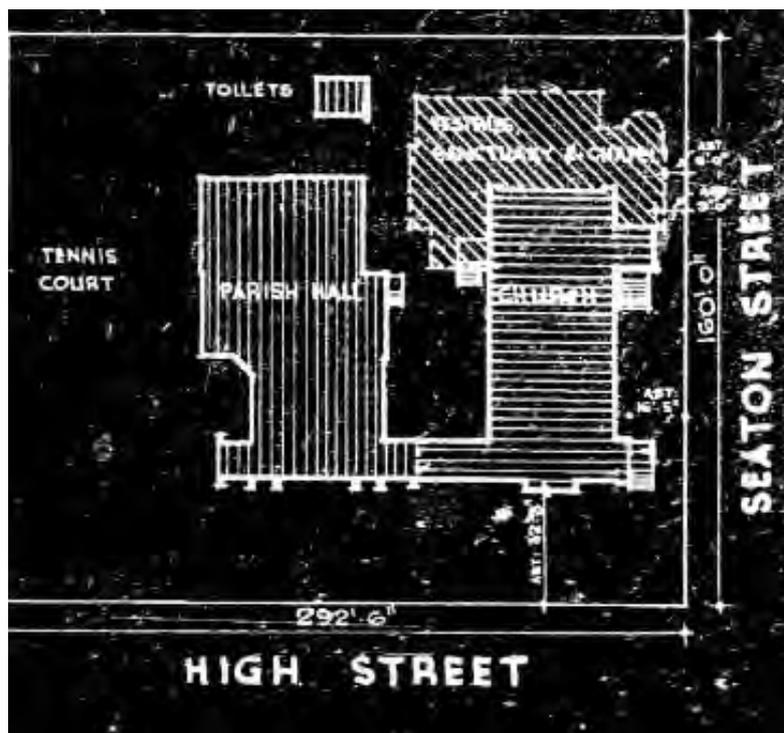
Proposed site plan of the new St Oswald's Anglican Church (date 1955). The old church building is referred to as Parish Hall in the plan. (Source: BP 16263)
